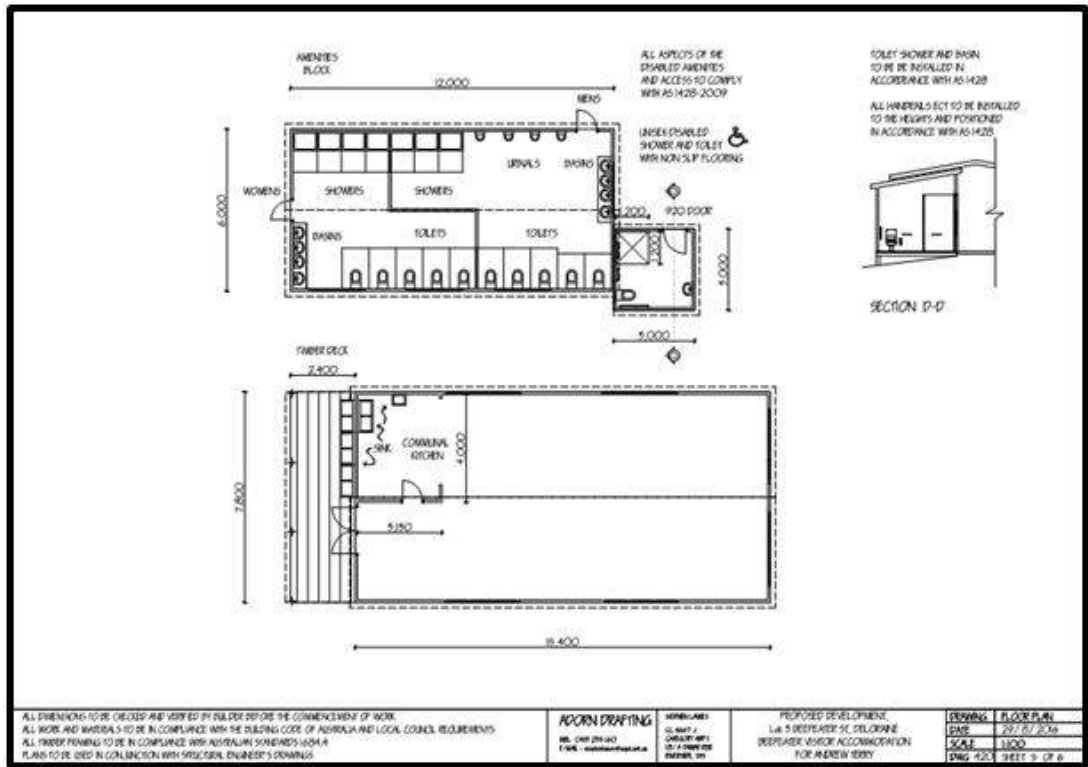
Amenities block layout (Adorn Drafting, 2016)
